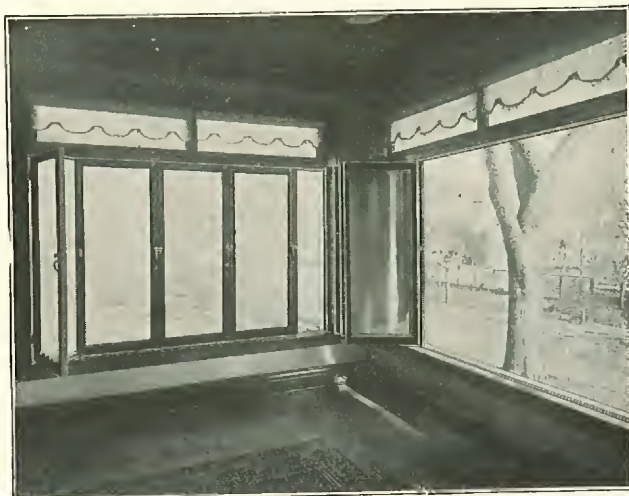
Interior view of sun parlor "AiR-Way" equipped—front windows wide open, side window open at both ends.
